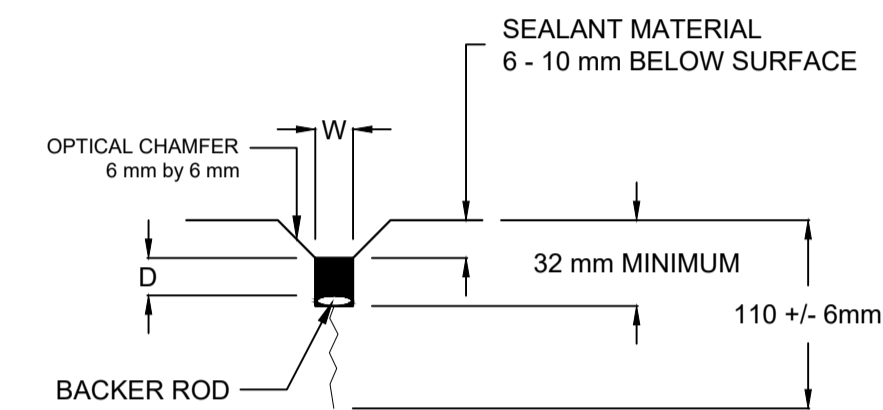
RIGID PAVEMENT JOINT TYPES AND DETAILS
